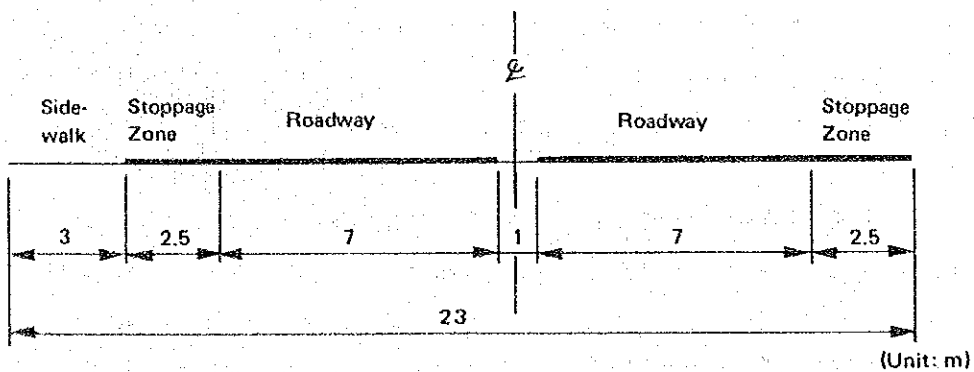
Cross Section of Port Roads (4 Lanes)
